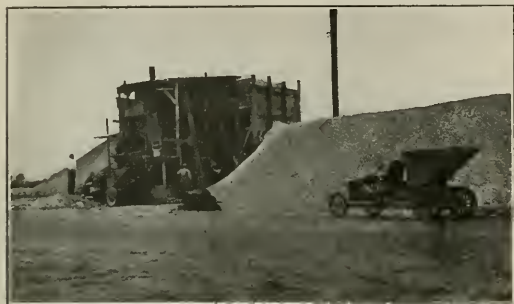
CENTRAL MIXING PLANT, SHOWING MATERIAL STORAGE
